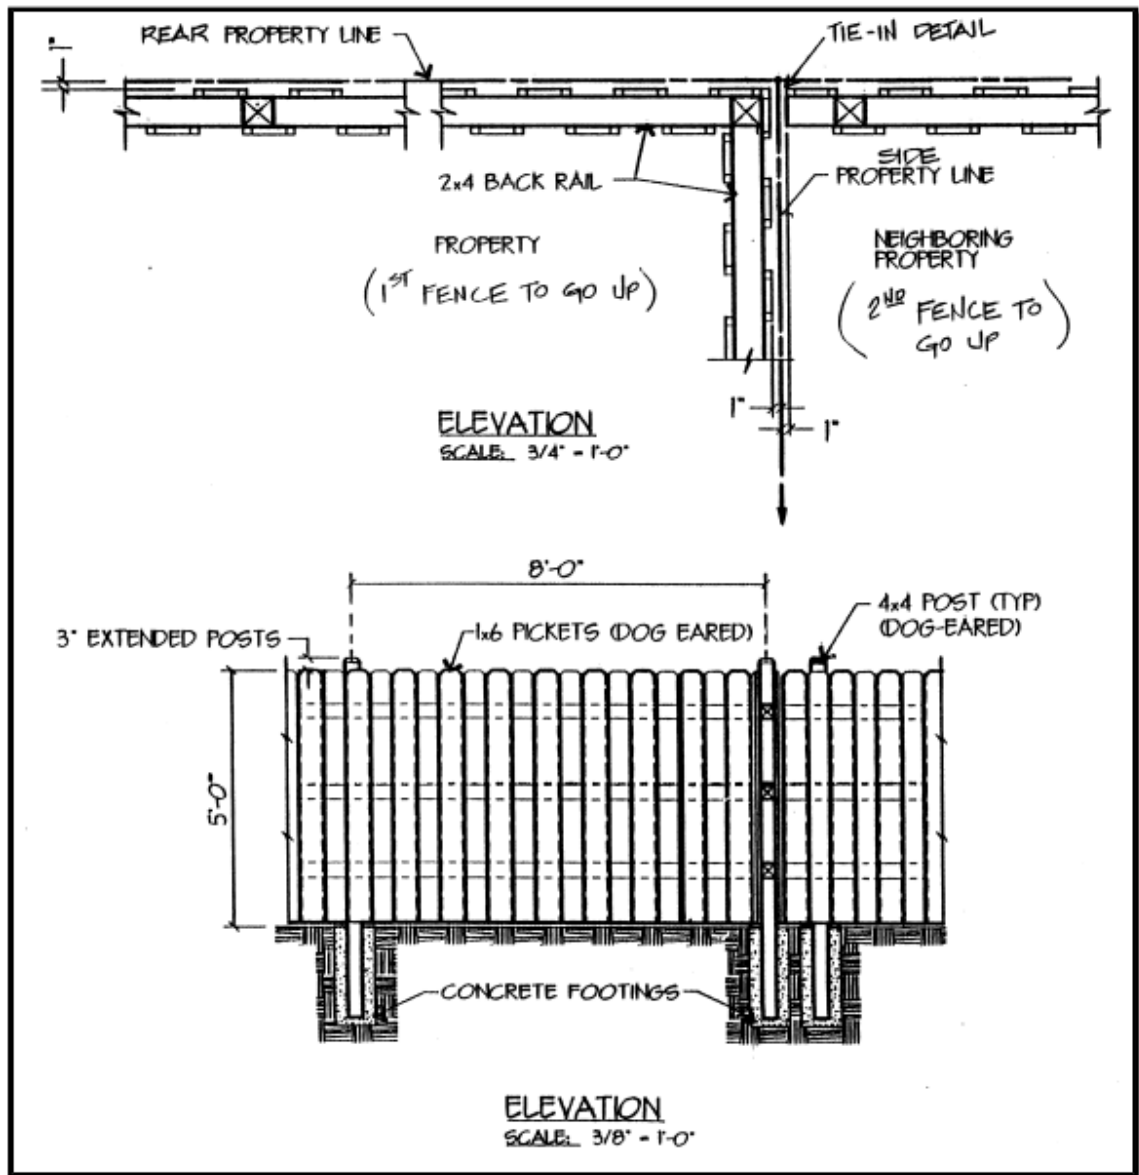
Drawing details for constructing a new fence adjacent to an existing fence.
